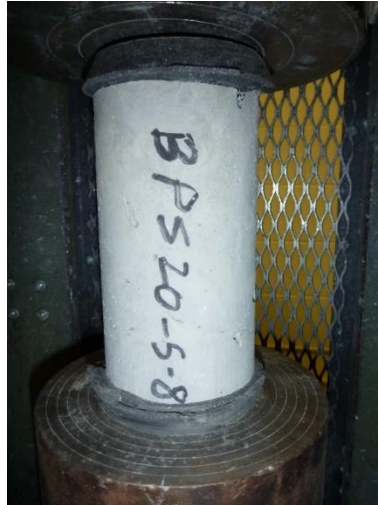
EDCC cylinder mounted in Cylinder Machine
